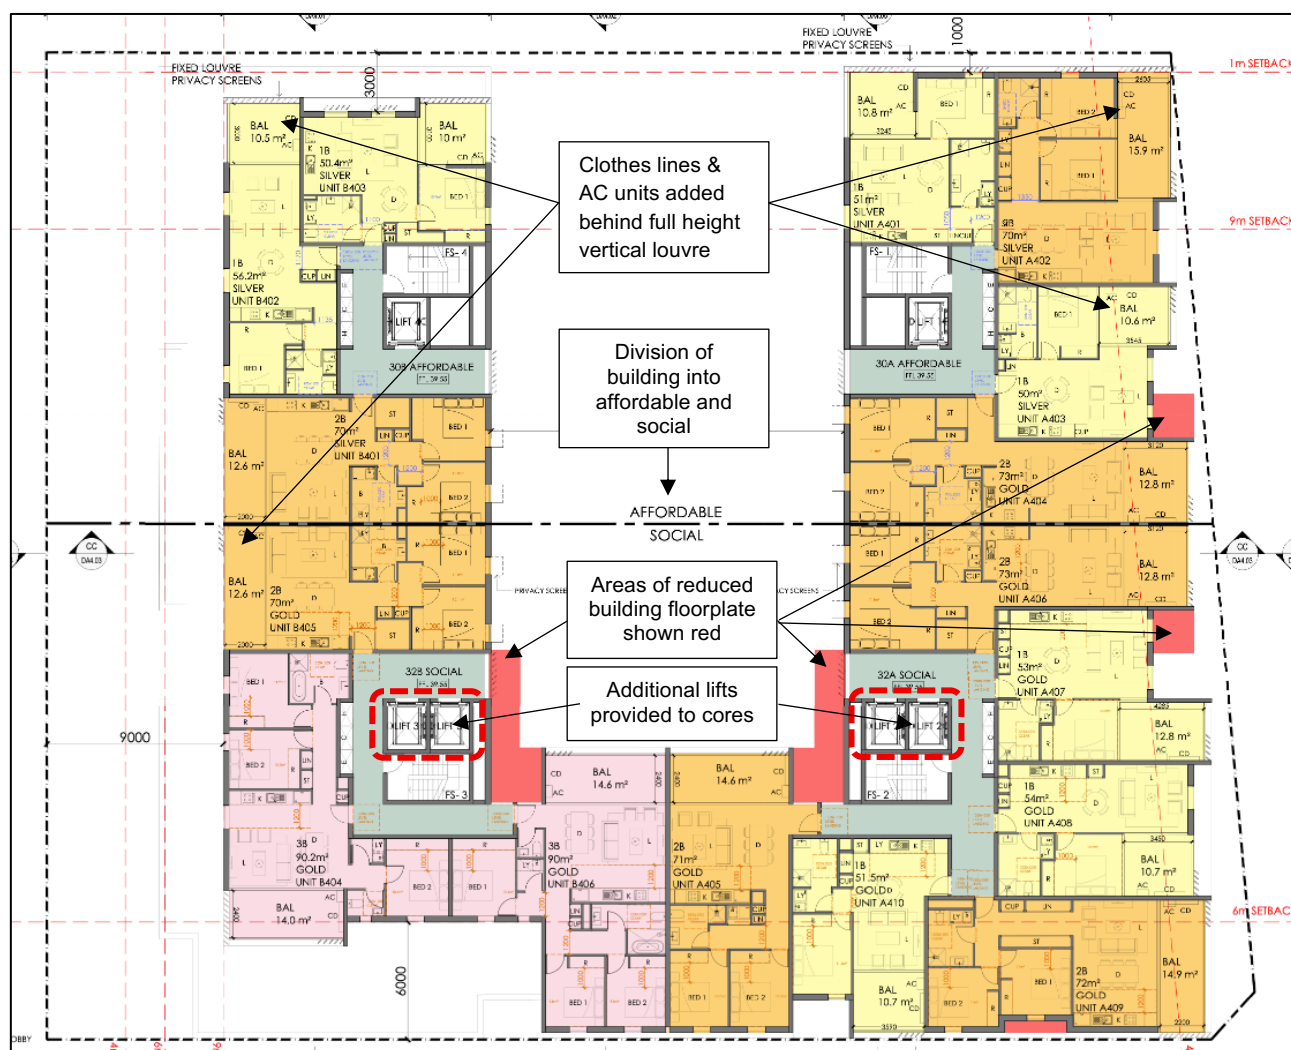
Extract from Level 4 Plan indicating key changes to a typical floor level
